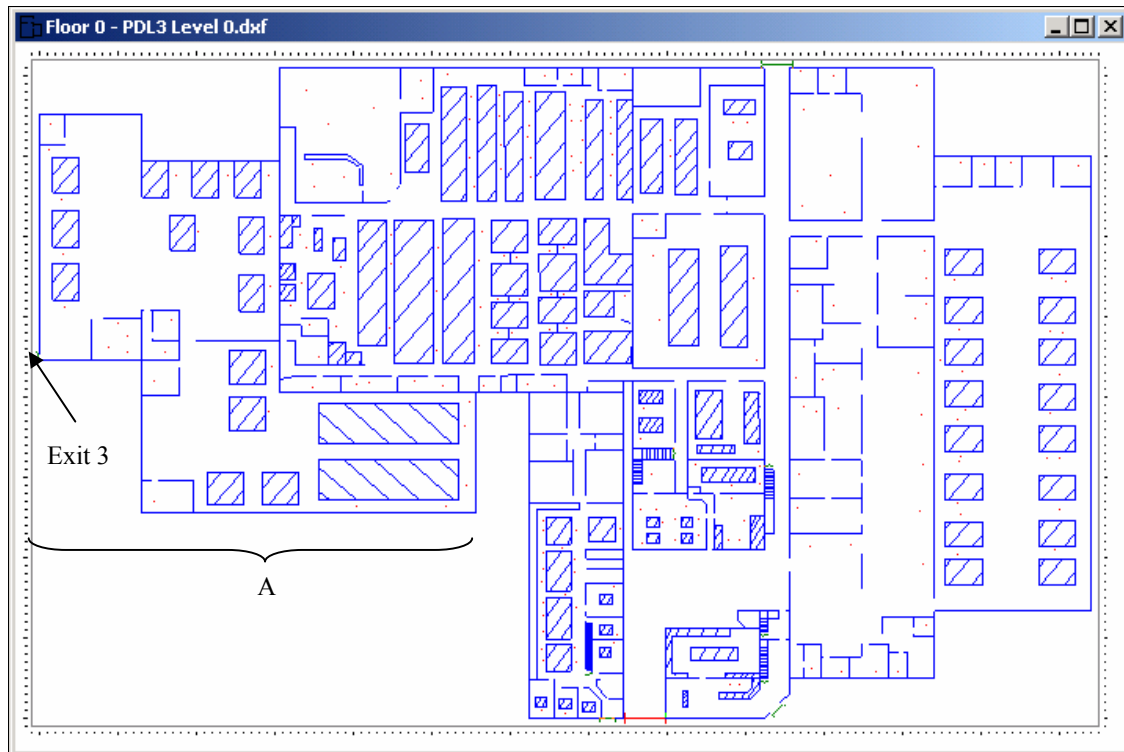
Ground floor of PDL-Plan 4 (A and Exit 3)
